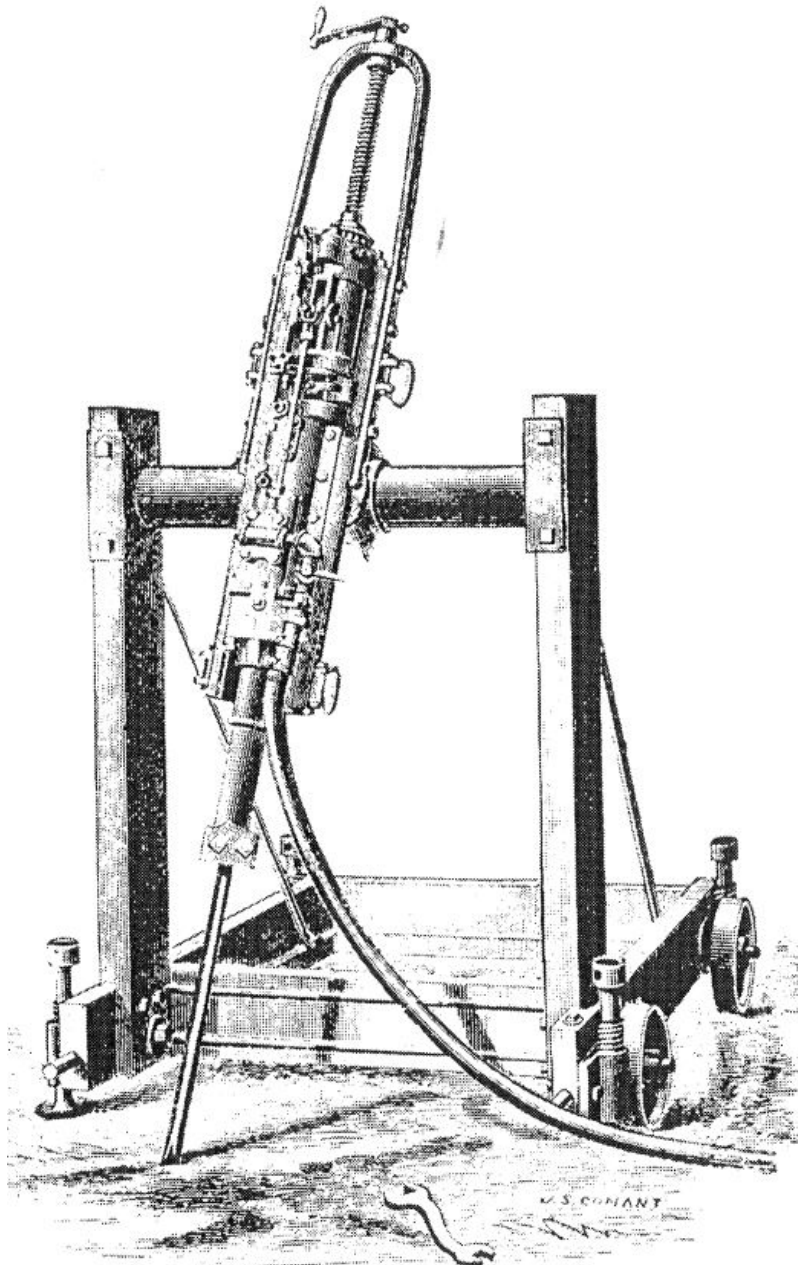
A primitive rock drilling machine, Burleigh's drill used in 19th century (Andre, 1876)
